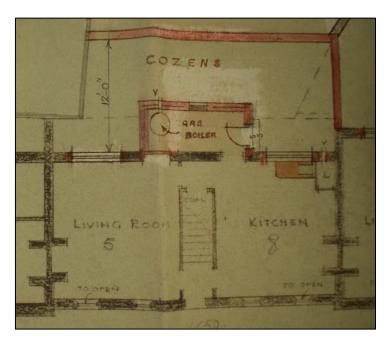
Proposed 1932 ground floor alterations to No. 2 Magdalene Lane (SWHT Ref. D/B/ta/24/1/79/1648)
